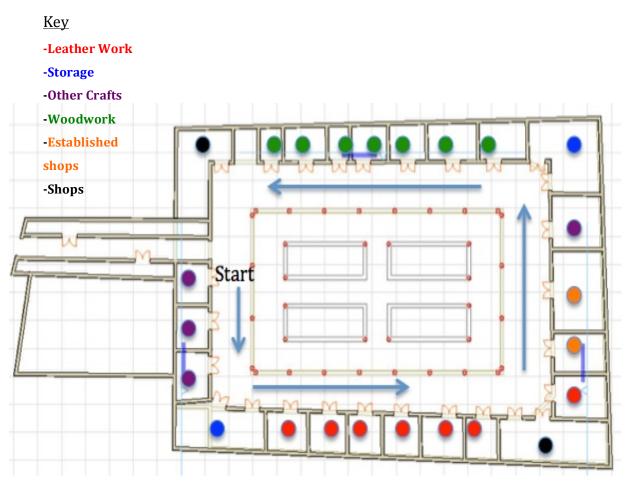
Propose new floor plan and layout of foundouk Jdilda
